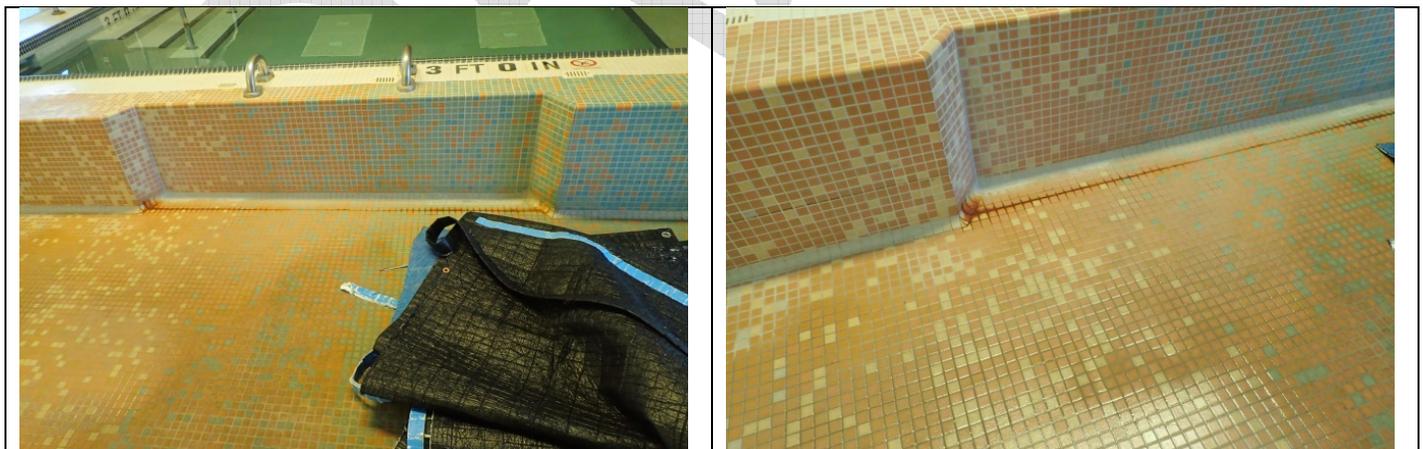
Pool cover results in standing water, staining of tile and grout, and saturation of concrete deck to rebar below.
